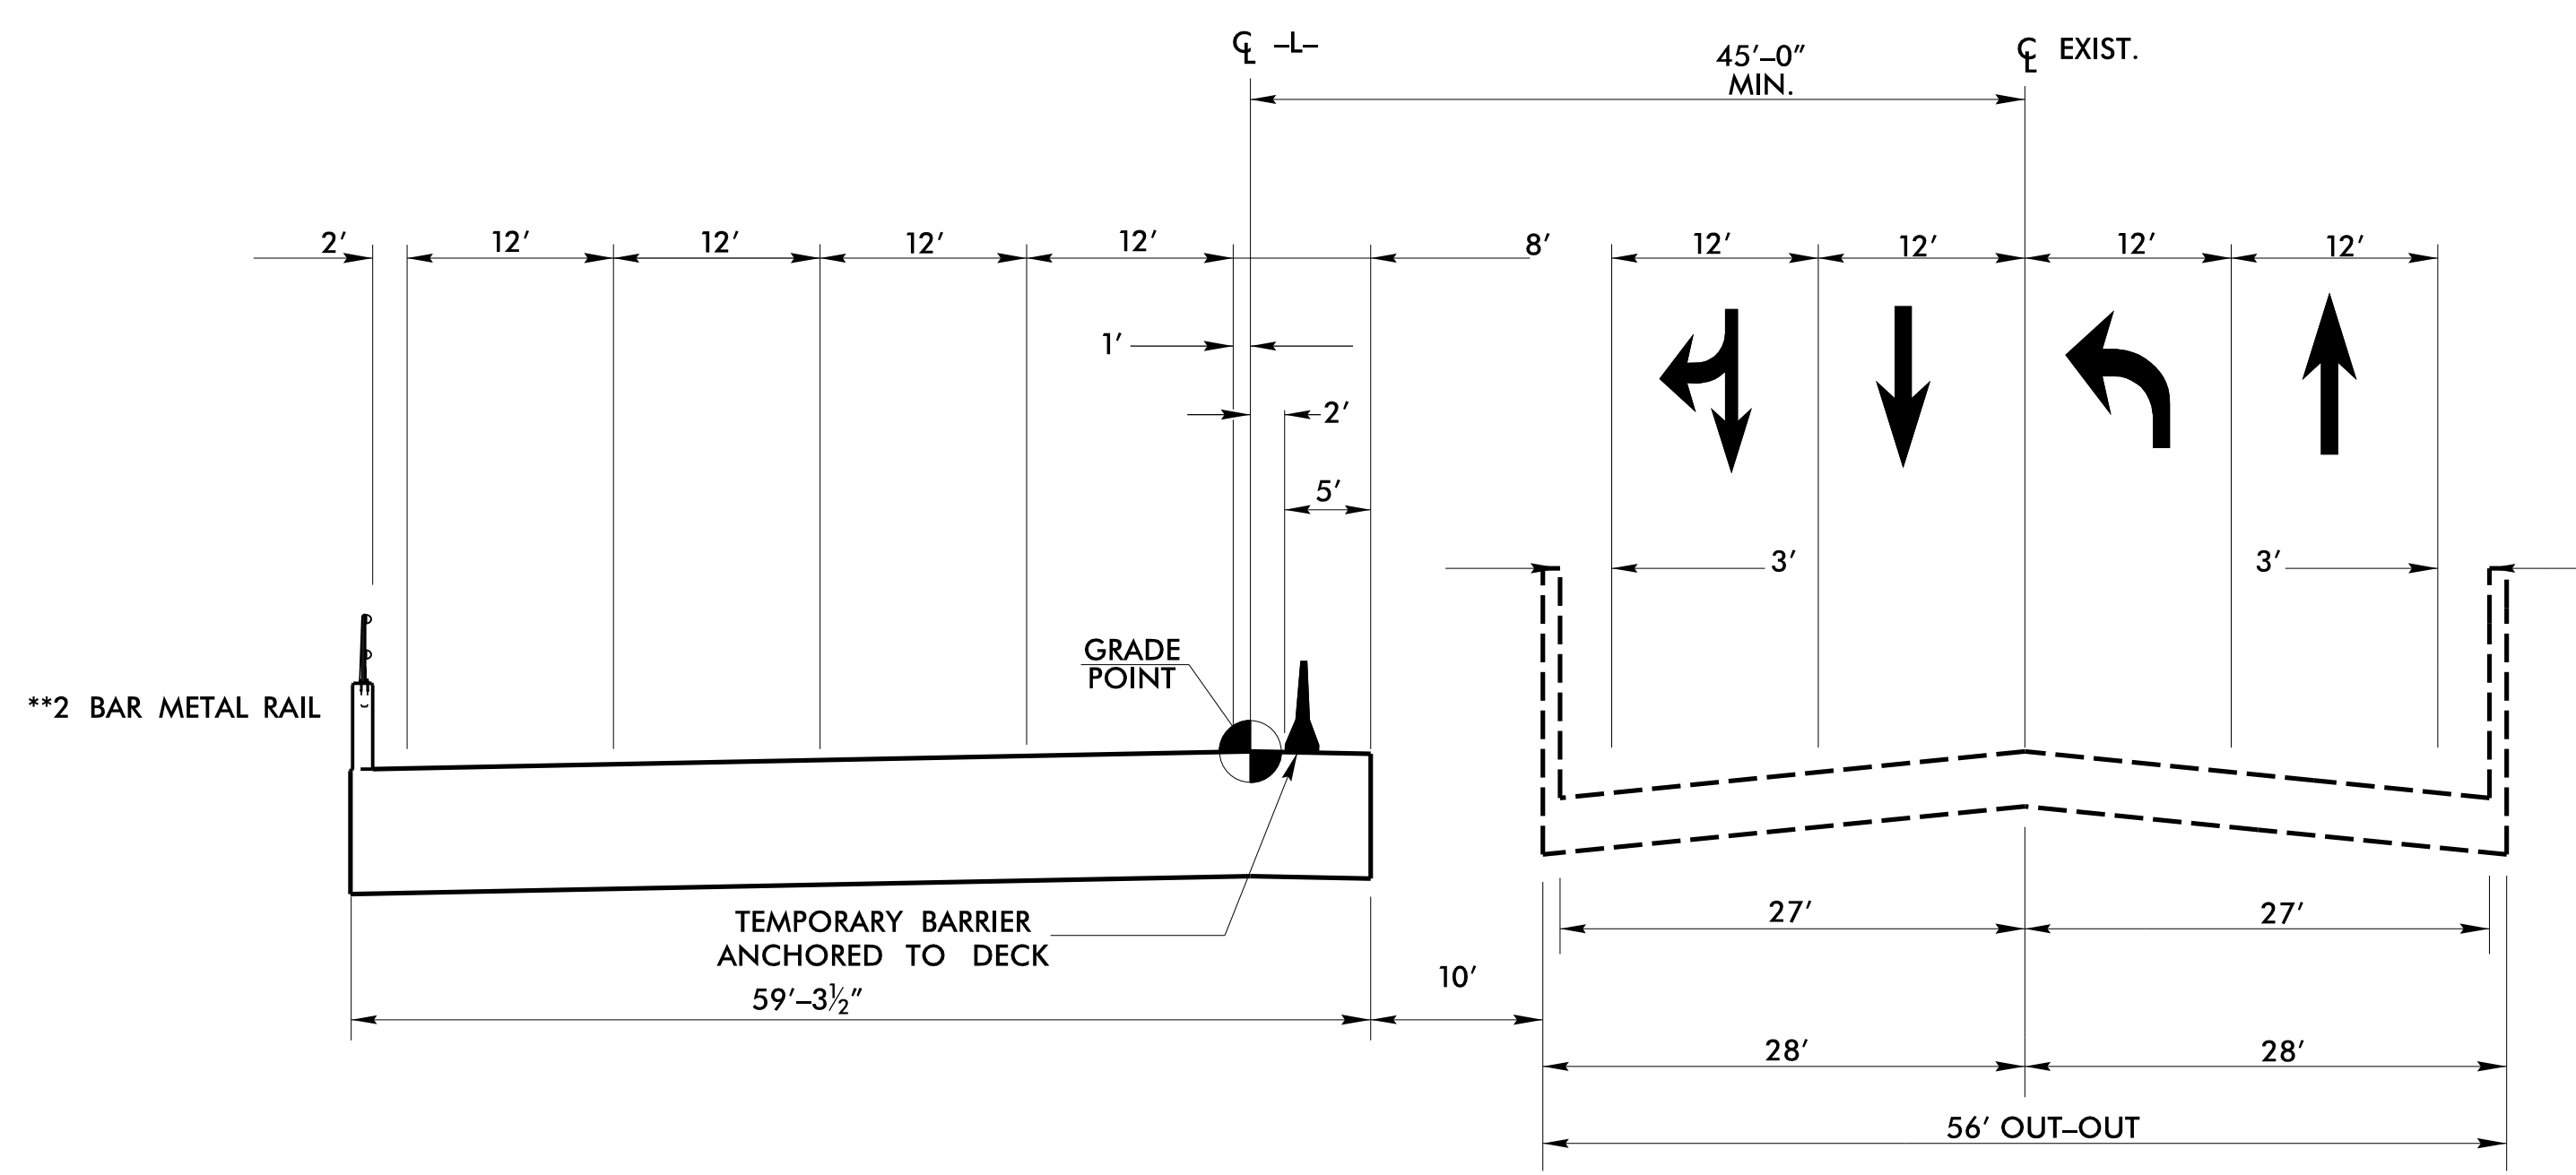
DETAIL OF ROADWAY UNDER PROPOSED STRUCTURE
